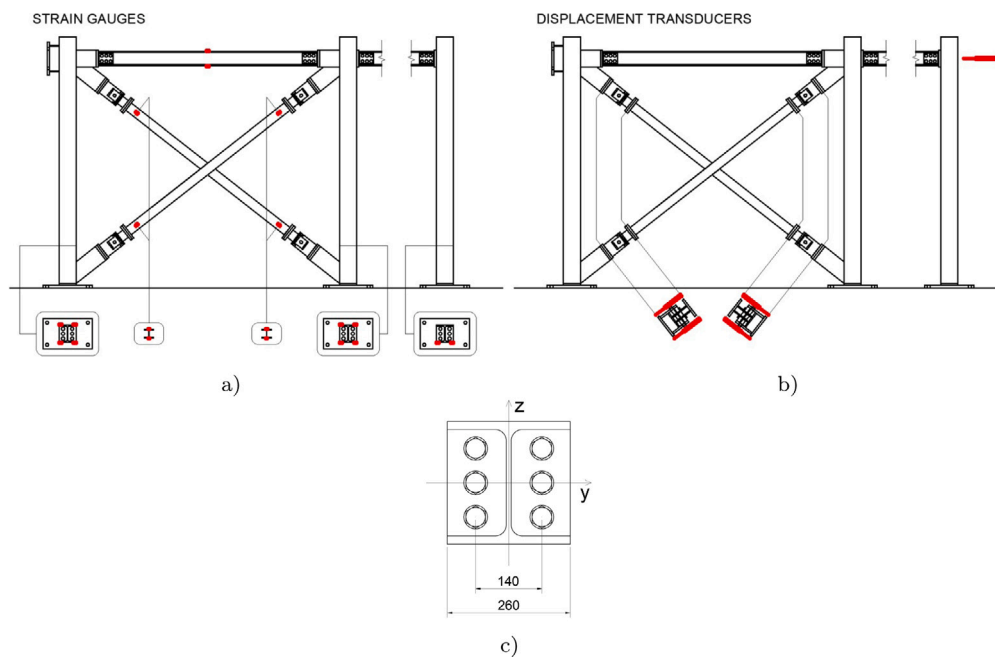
Instruments configuration: (a) strain gauges applied on bracing diagonals, base columns and beam mid-span; (b) displacement transducers applied on the sides of the DRBrC connections; (c) plan section of the base column connection (HE 260 B).
